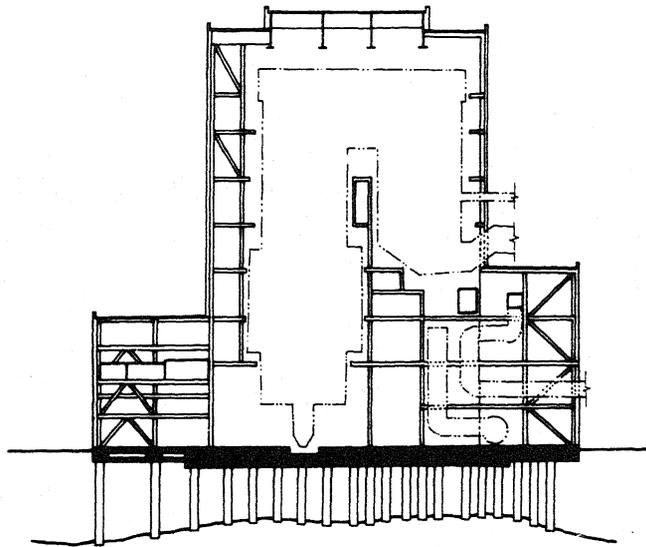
SECTION OF A 700 MW COAL FIRED BOILER BUILDING
